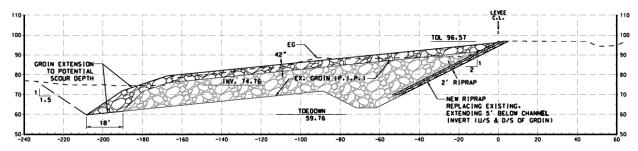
Typical Cross Section of Alternative E (Sta. 312+00)
